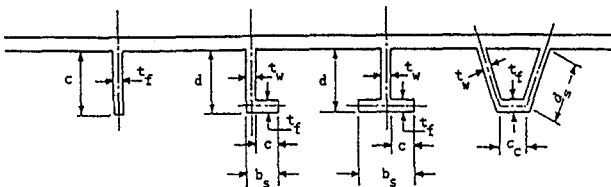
Assumed Cross-Sections of Longitudinal Stiffeners
